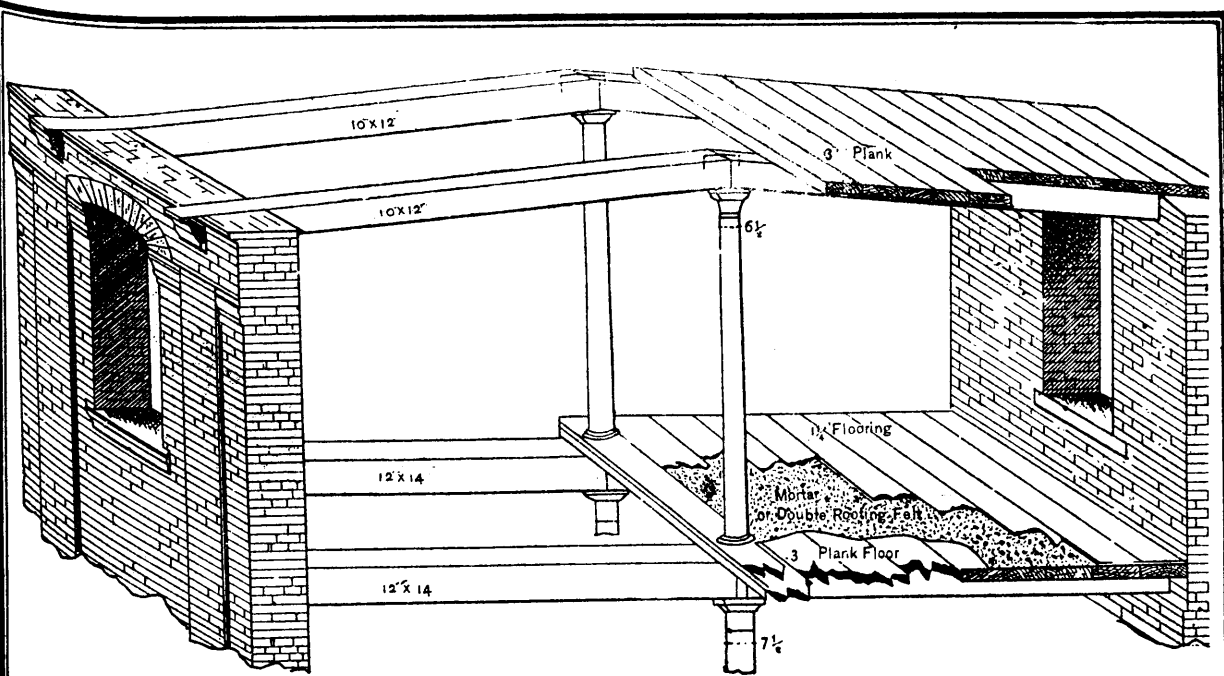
Perspective View showing Arrangement of Floor Beams, Rafters, Columns, &c., and Manner of Laying Floor.
